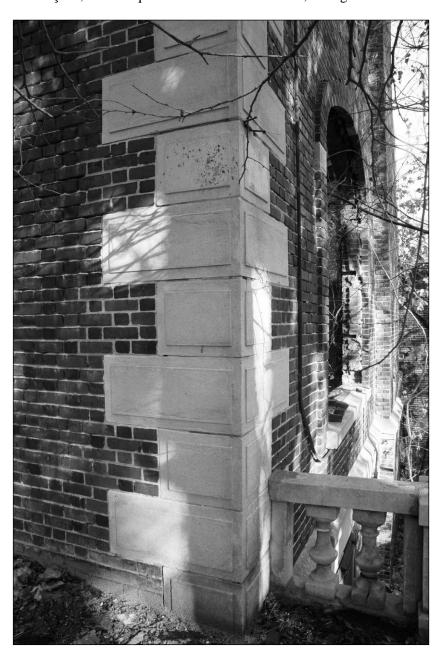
Western façade, detail—northern end of porch balustrade, facing southeast.
